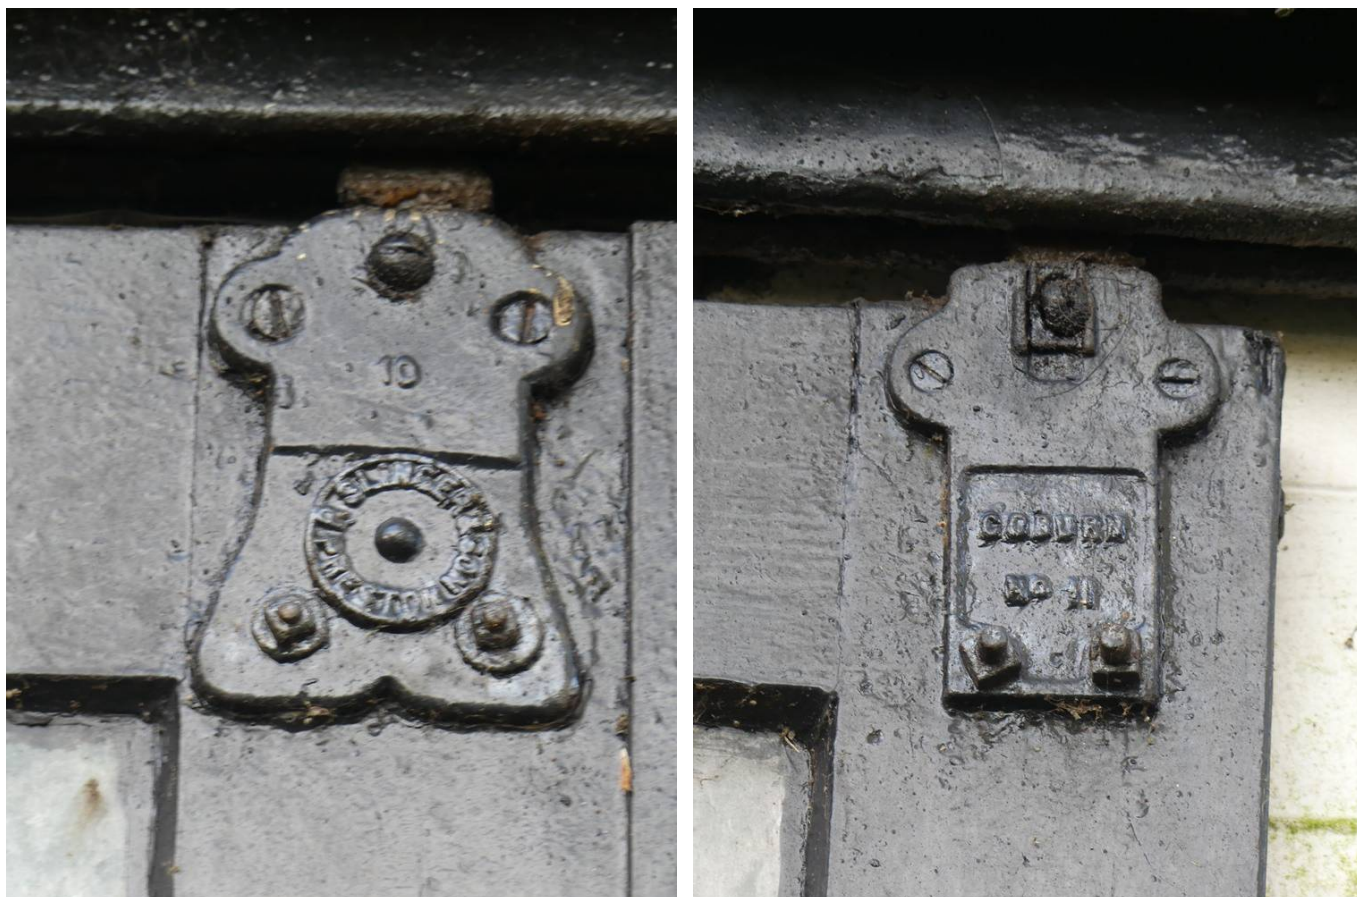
(left): Sliding door runner marked "R Slinger & Son Preston"
